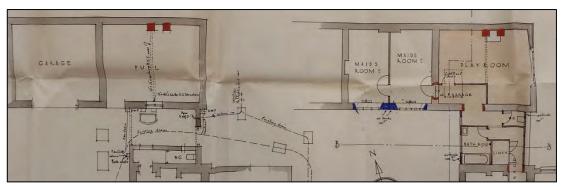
1933 plan of proposals for link structure; ground floor left, first floor right (Bedford Archives; Ref: RDBP 2/304)
